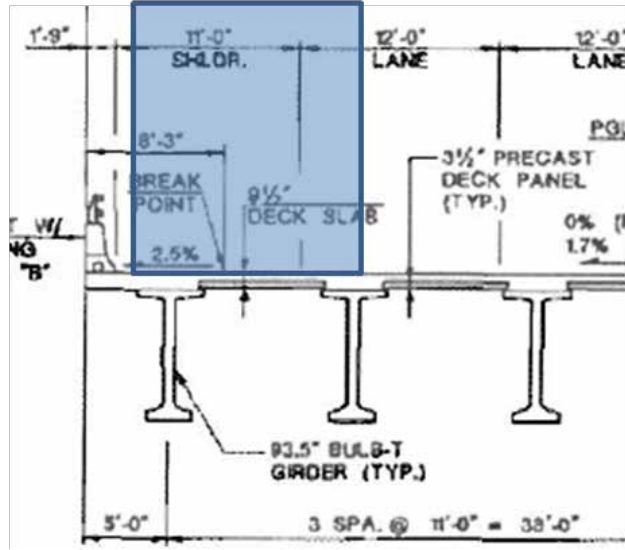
Typical cross section of Route 52 Bridge with the survey area marked in blue
